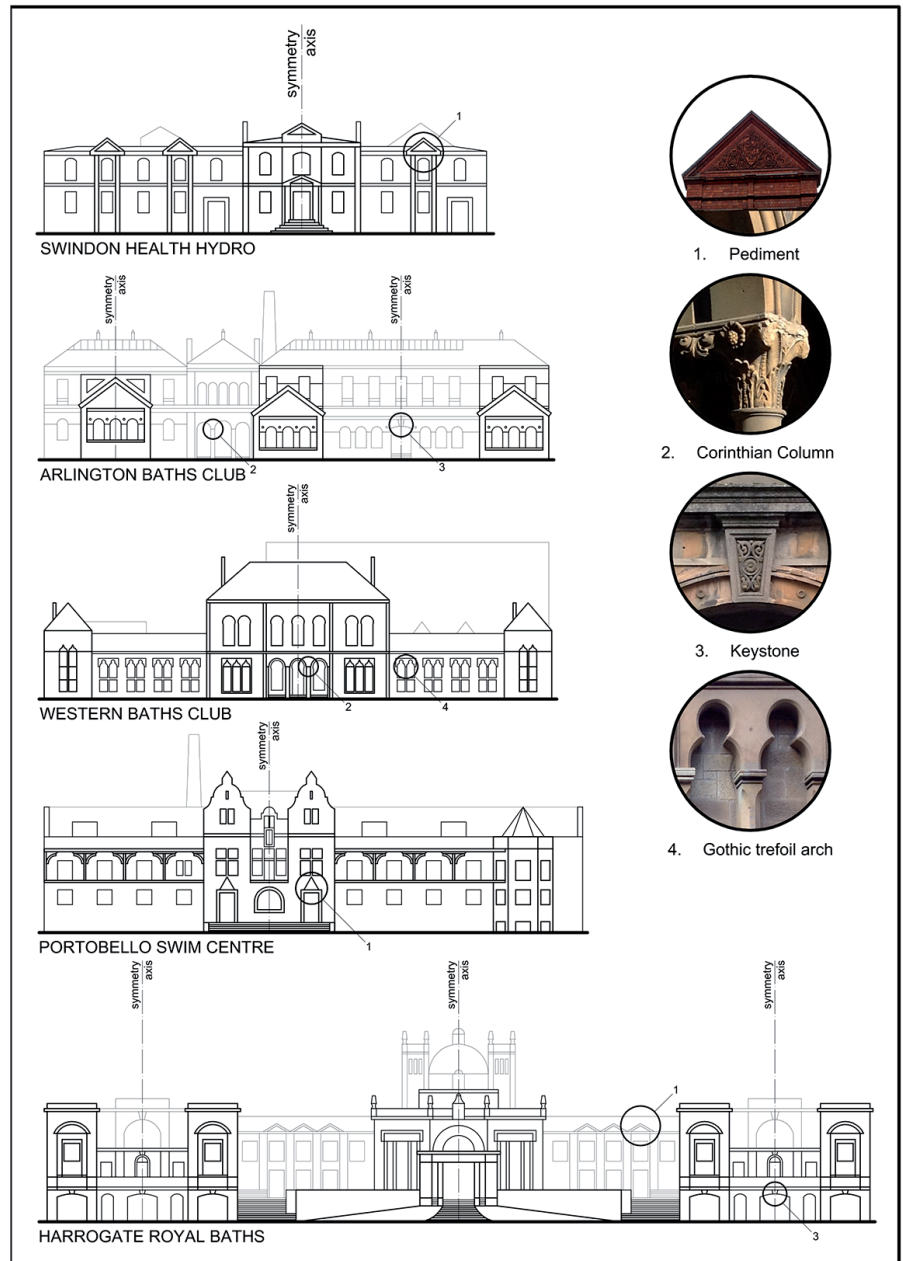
Front elevation drawings of the baths and point details (prepared by the author).
